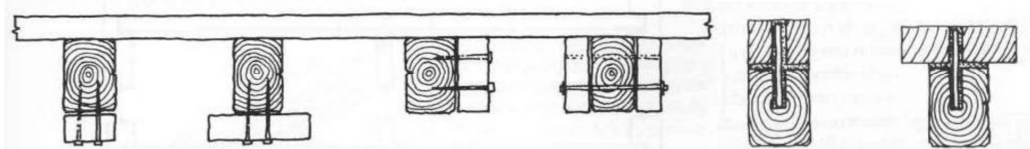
New wooden elements or beams connected to the older structure (Arriaga et al., 2002)
